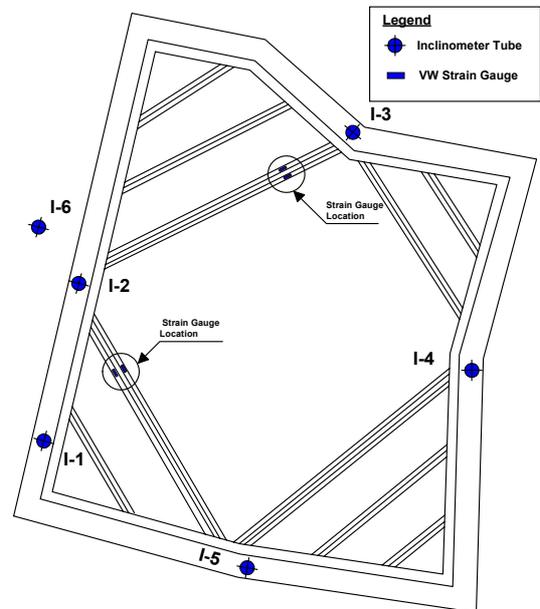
Arrangement of strutting system with stain gauges (after EIT 1999)
